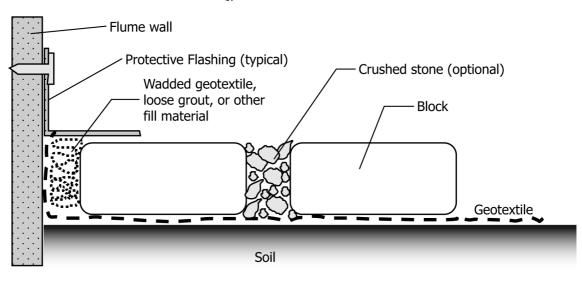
Recommended Sidewall Detail (Cross Section View)
